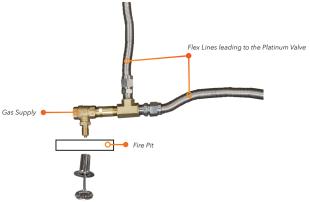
Connecting the Flex Lines from the Platinum Valve to the Key Valve
